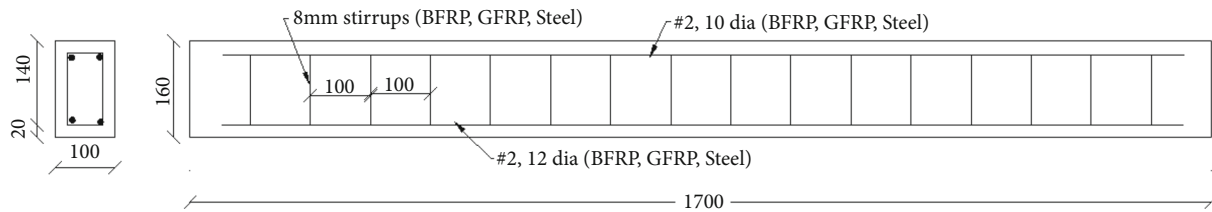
Geometry and reinforcement details of the beam (all dimensions are in mm).
